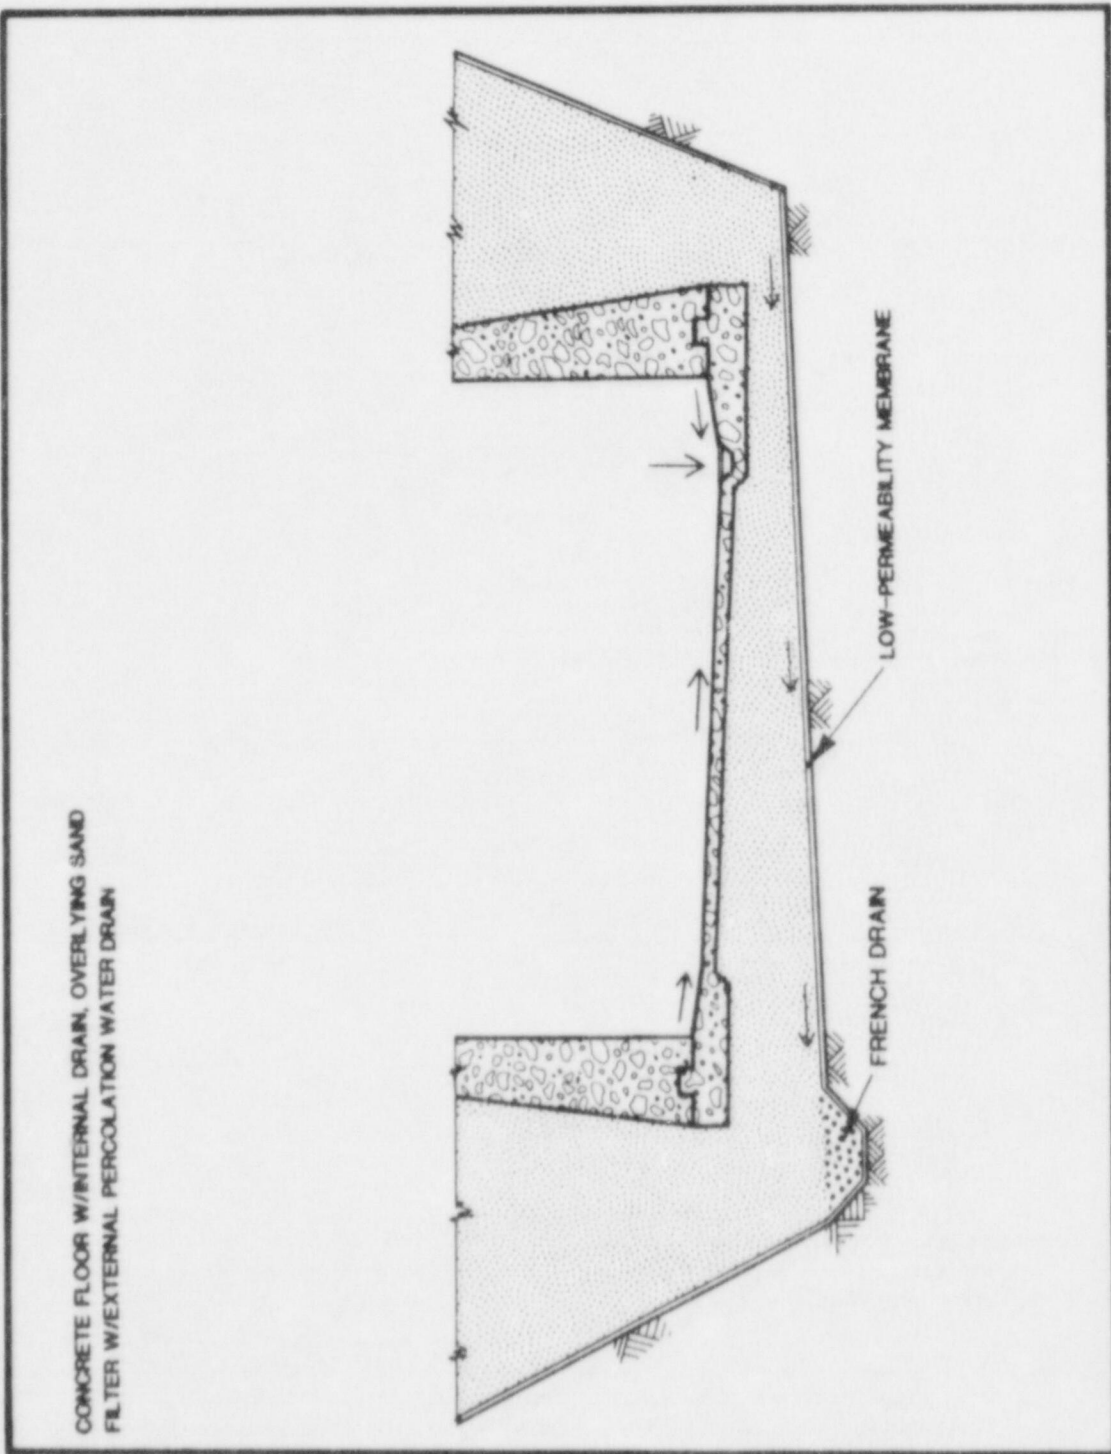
Cross section of belowground vault, drainage layer and vault slab and foundation.
